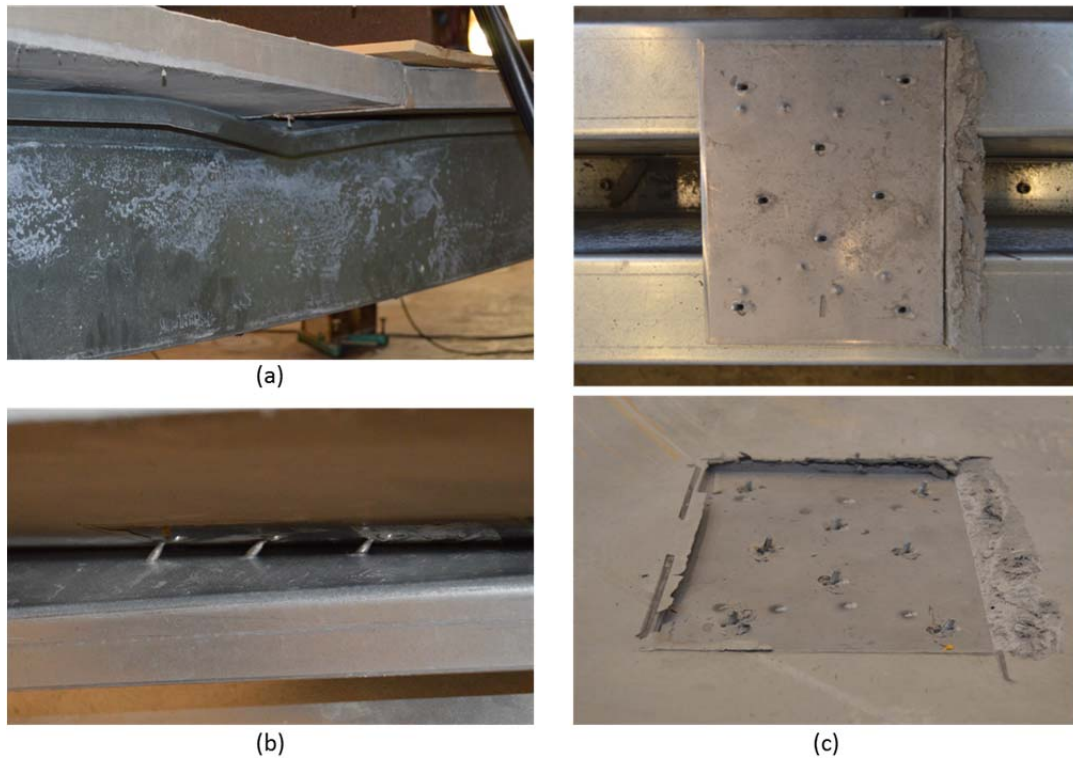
Failure of MP (third panel): (a) buckling of flange of steel joists under one of the loading point, (b) failure of shear connection between cast-in elements and steel substructure and (c) failure of cast-in element
